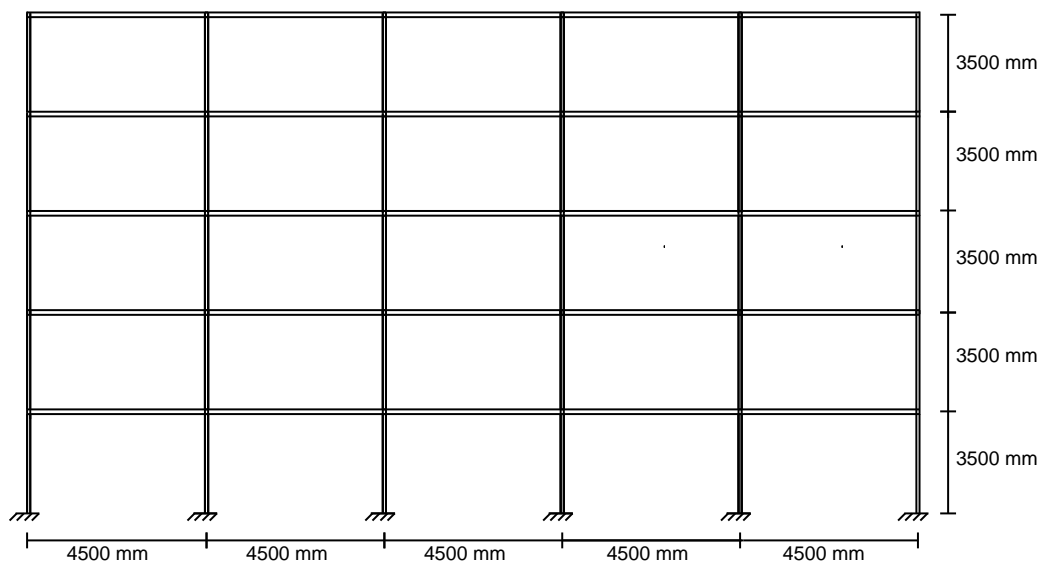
2D elevation view of the five story building. All structural members are modeled as elastic.
